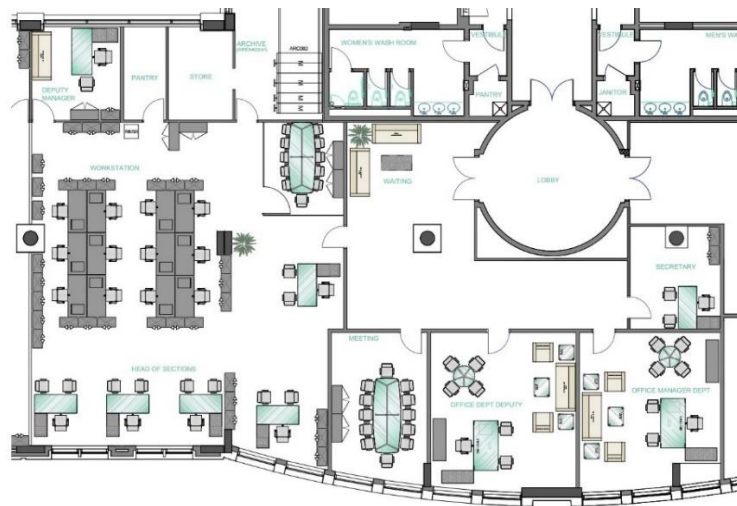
Typical floor plan inclusive of various workplaces layout and furnishing
